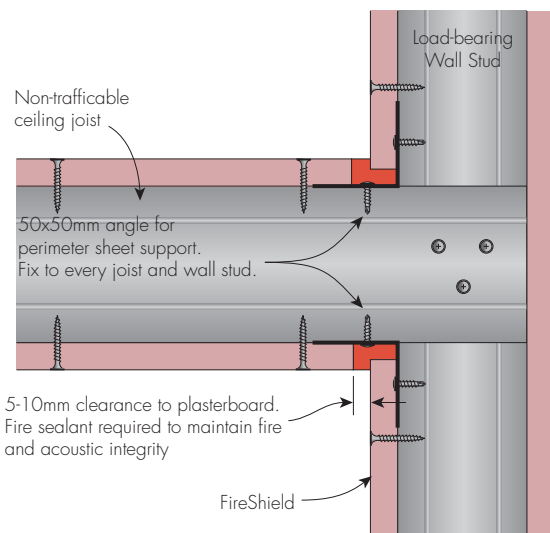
Non-Trafficable Ceiling to Plasterboard Wall
